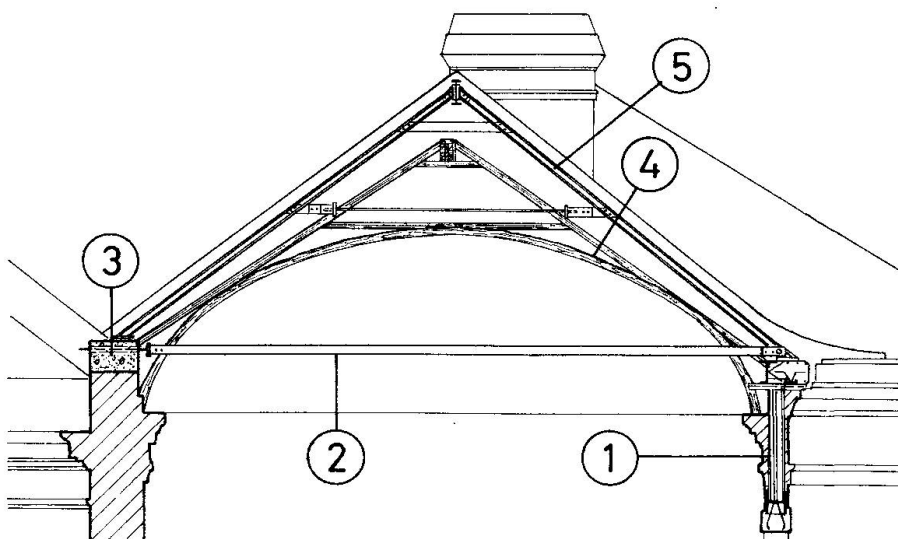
Palace North Loggia - Ceiling Cross Section.
